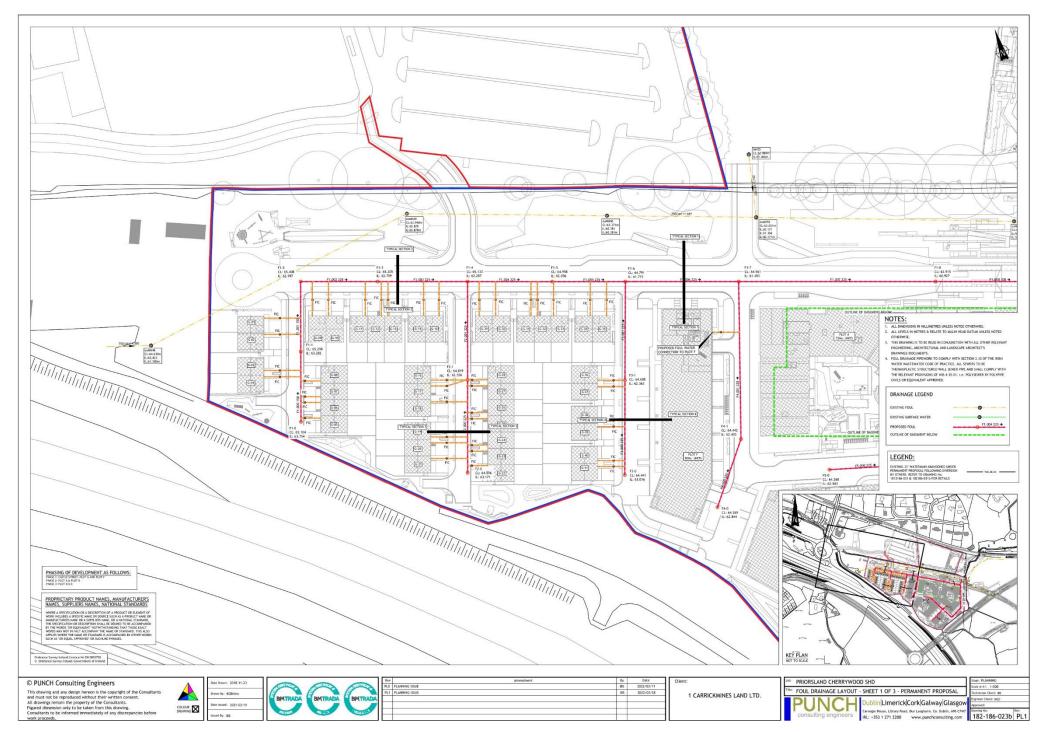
Foul water drainage – Permanent Proposal (sheet 1)
